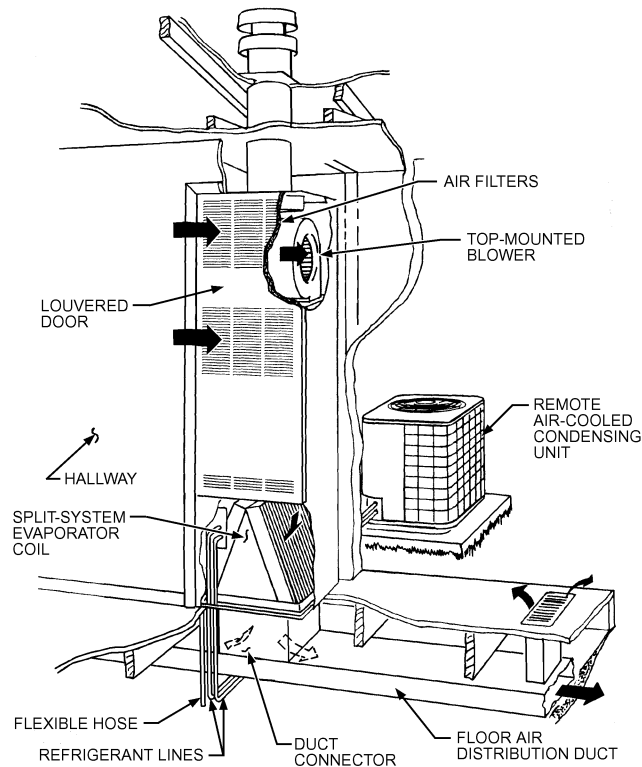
Typical Installation of Heating and Cooling Equipment for Manufactured Home
